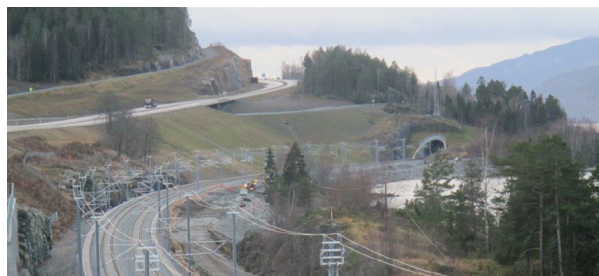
The E6 – Dovrebanen Joint Road and Railway project along the lake Mjøsa in Norway, excavated rock used as embankment fill, landscaping, concrete aggregates or temporary stored at Kolomoen for future use (Photo NPRA).
